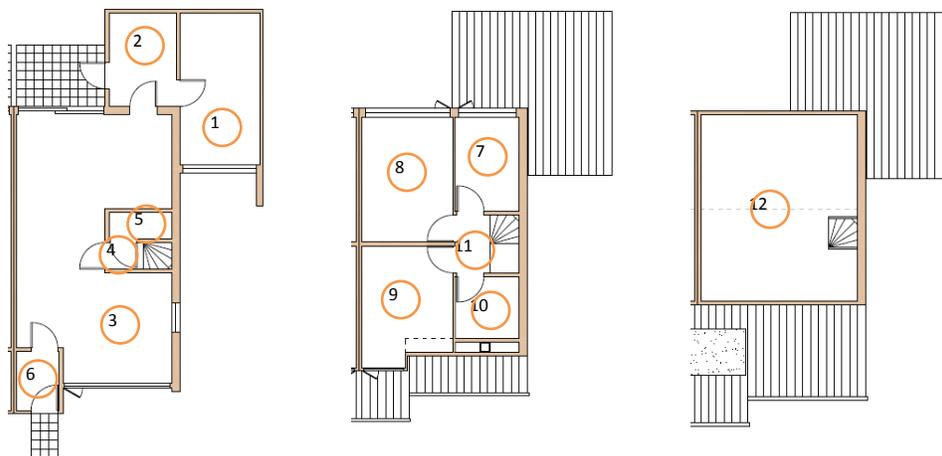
Planes of the simulated semi-detached house. From left to right: ground, first and attic floors.
